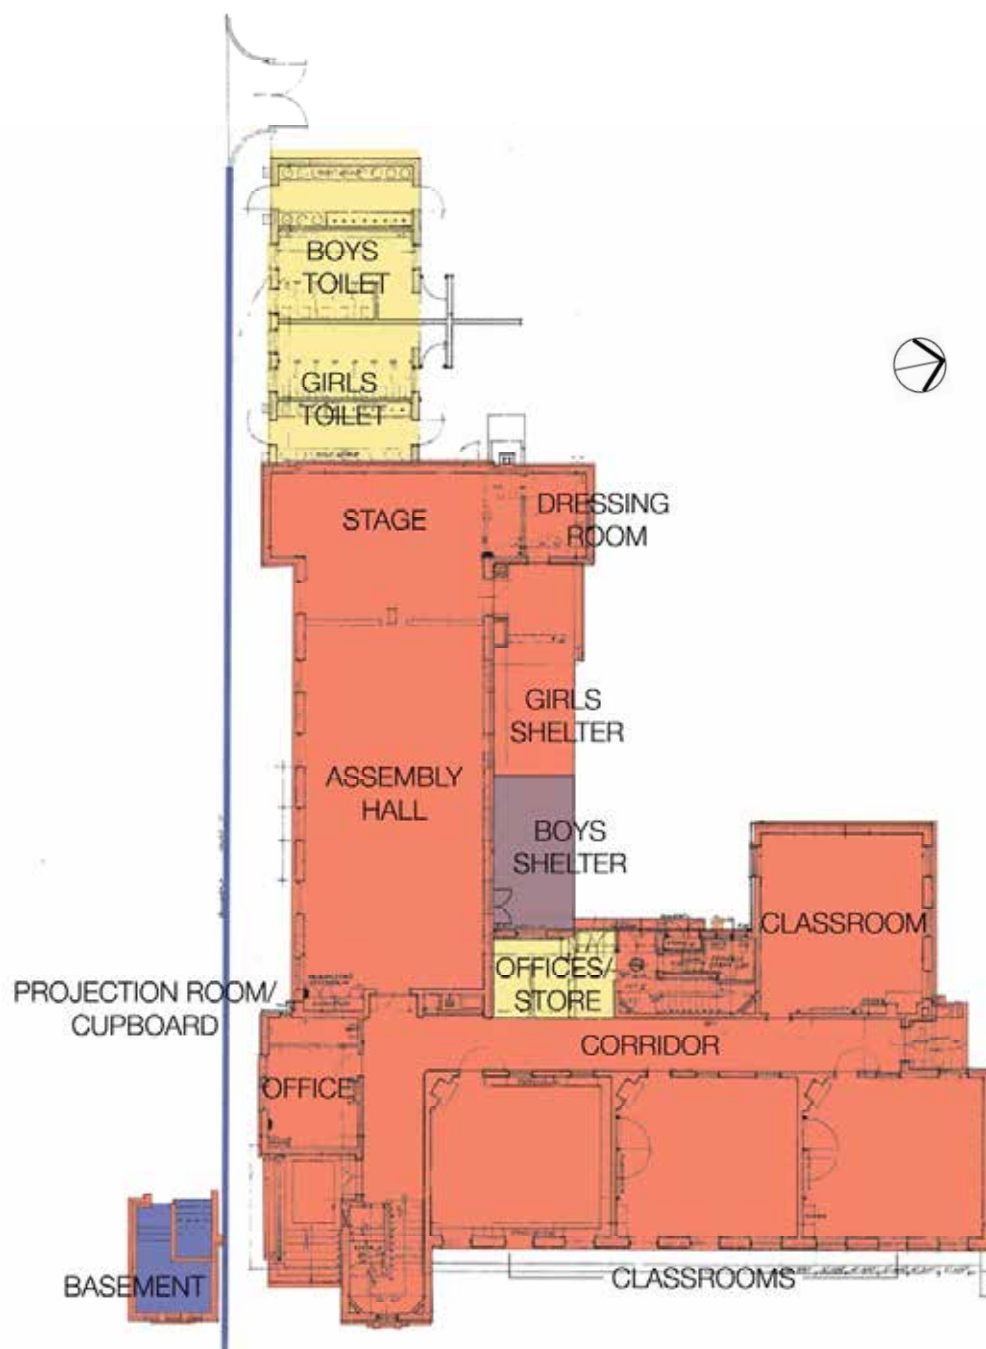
Significance of spaces in Fort Street Public School – Ground floor
